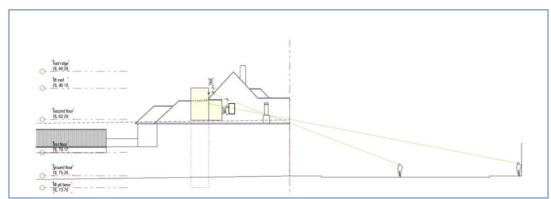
Sight distance assessment viewing western elevation, sightlines from middle of Argyle Street furthest southern side of Argyle Street.
